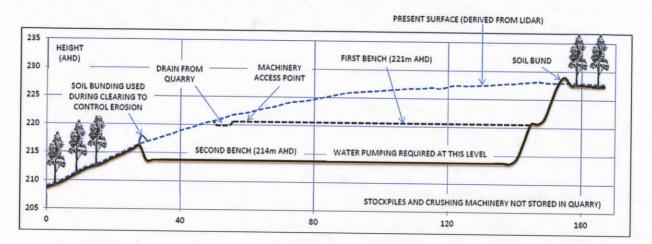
Cross-section of quarry extraction plan for the SW extraction area (Figure 2-2-6b of the DPEMP).
